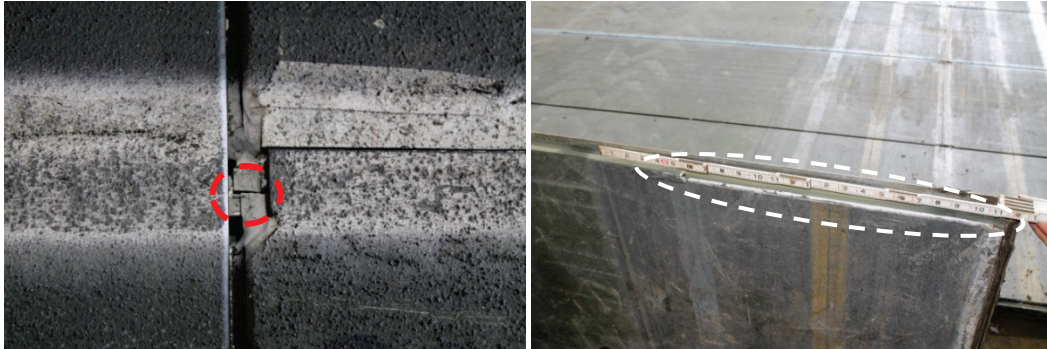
Layout of damaged and failed panels in the F-15-V item.
